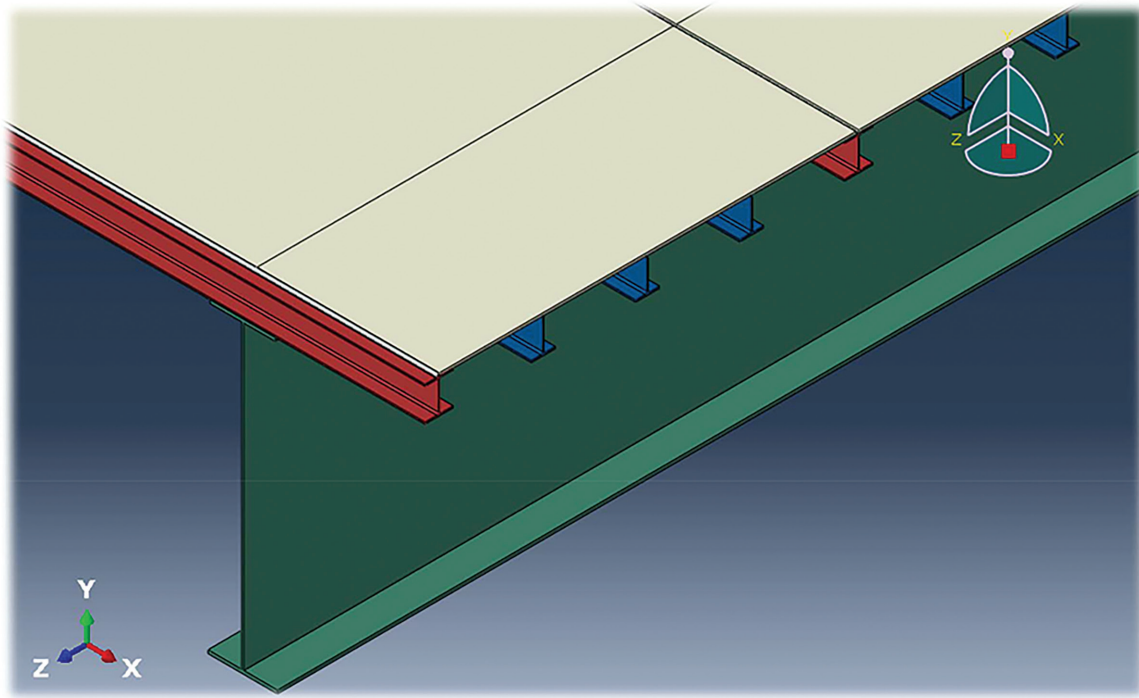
Preliminary finite element model of a bridge with an inverted WT deck system.
